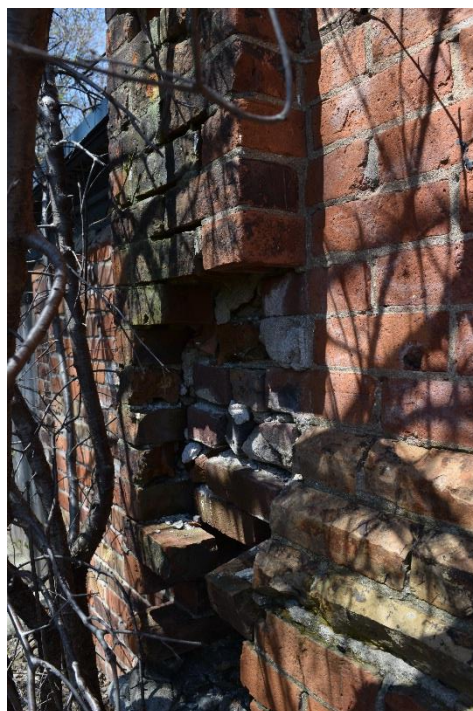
Section of collapsed outer wythe on the brick basement access addition (May 2016).
